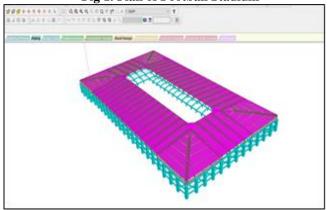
Model I: 3D Model of Roof Truss stadium (without shell roof covering)
